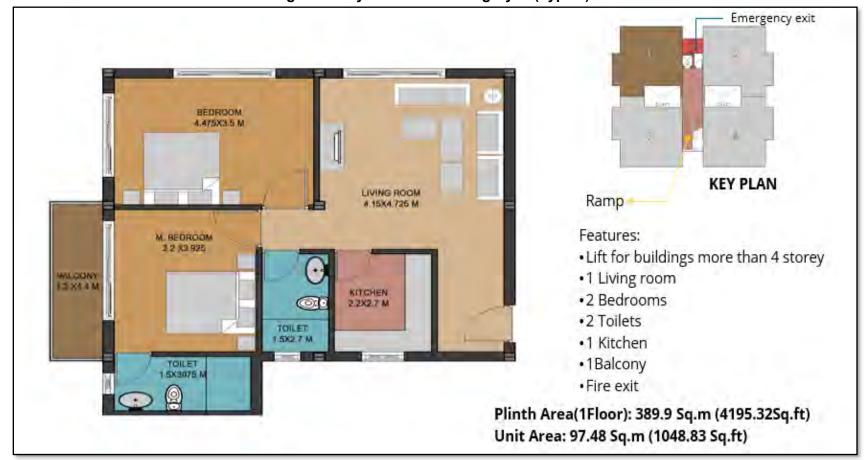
Layout Plan for Category III (Type 2)<sup>26</sup>
